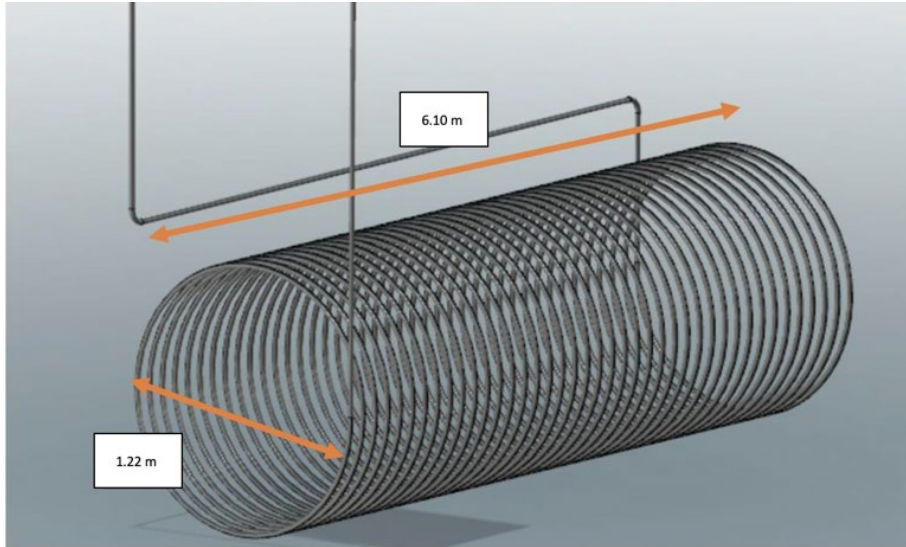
Cad Model of the Underground Geothermal Piping Configuration.
